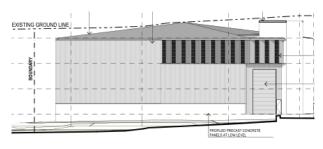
Proposed north elevation Source: Lahznimmo Architects
